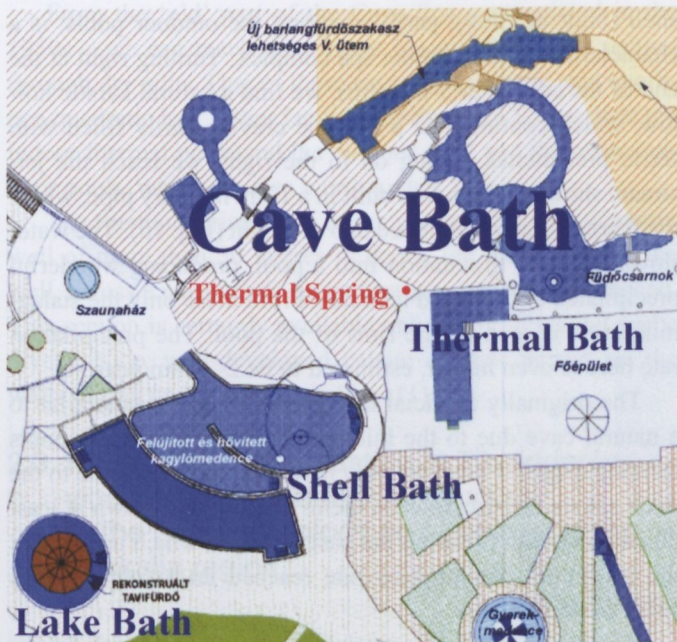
Indoor and outdoor facilities of the Miskolc Cave Spa.
